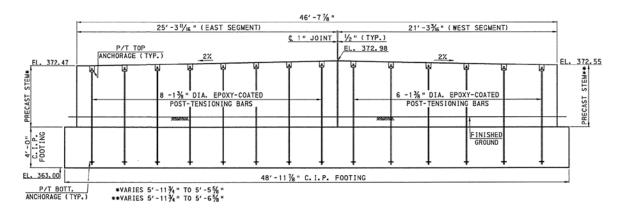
Abutment 1 Elevation (Abutment 2 similar)
